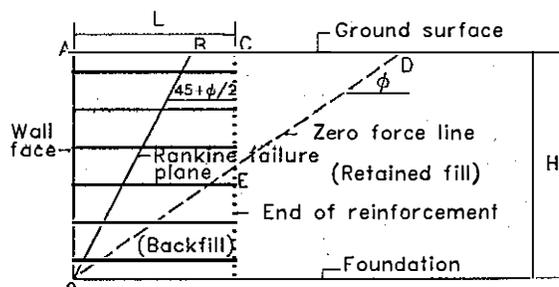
Sources of horizontal deformation in reinforced soil walls.
